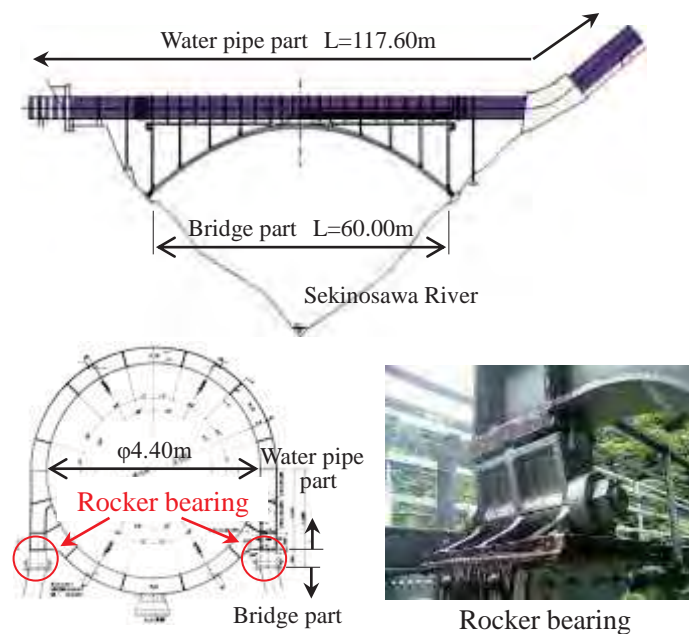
Side view and cross-section view of the Sekinosawa Water-tube Bridge
